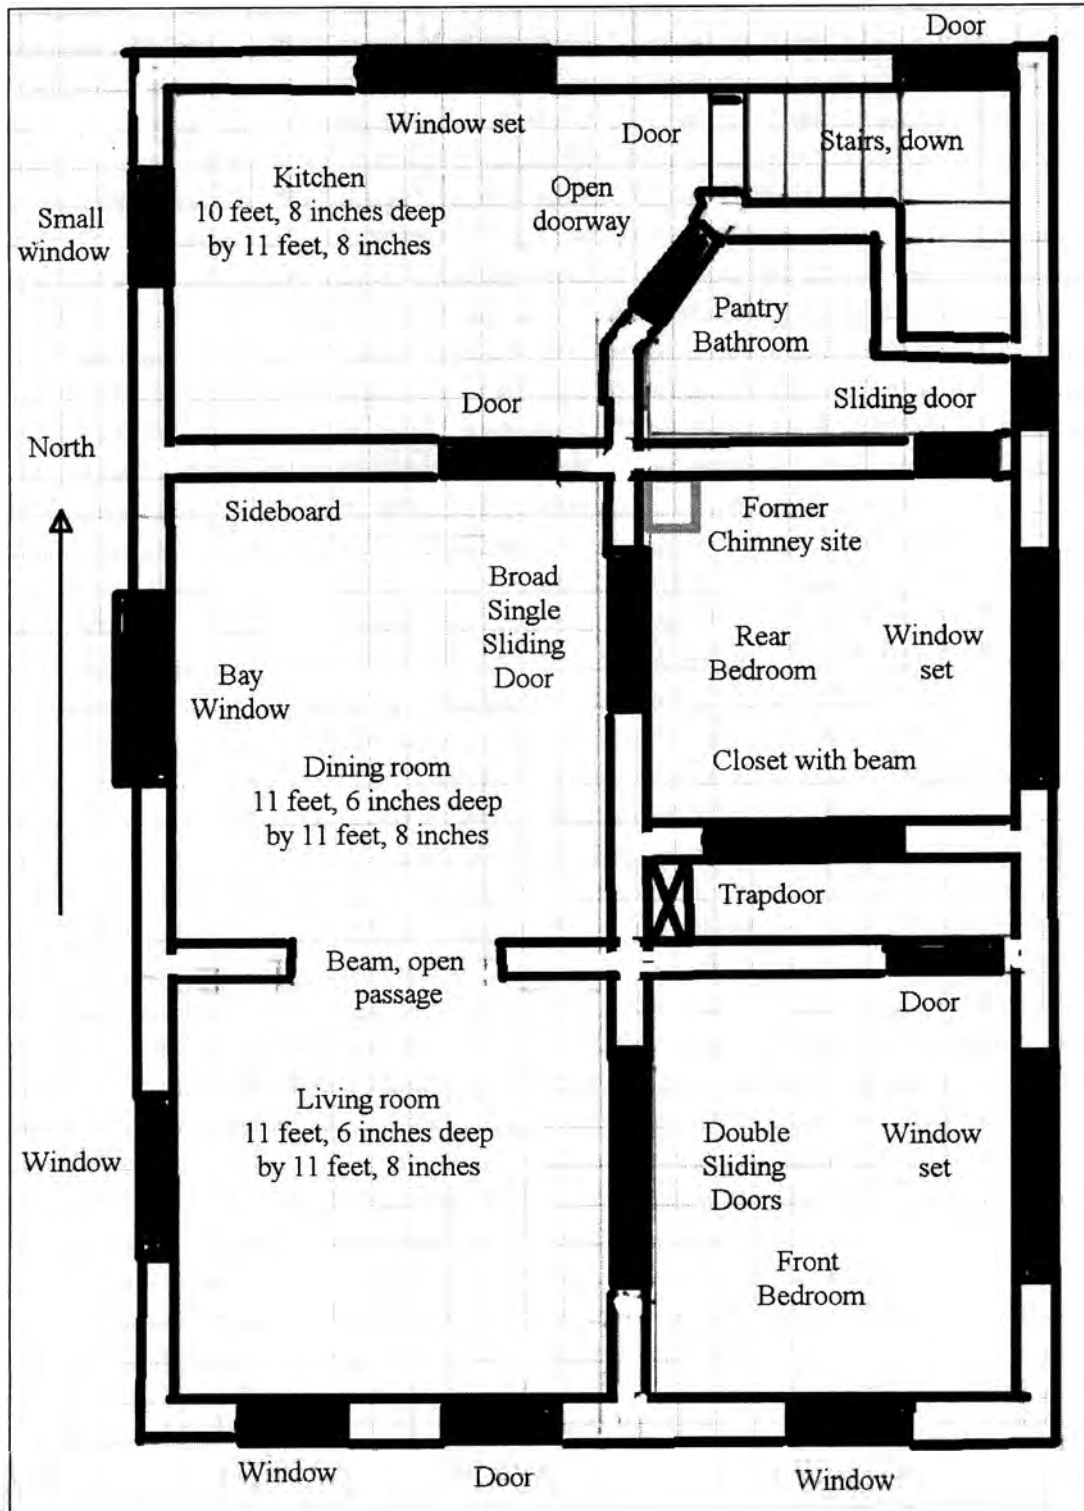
Approximate scaled floor plan (Jacobsen, April 2010)
